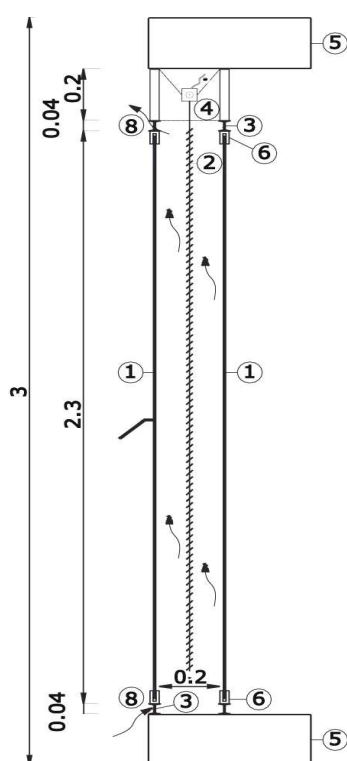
Example of a tested wall: double-skin façade: 1, 6 mm glass layer; 2, motorized solar protection ($W=0.025$ m); 3, metallic support; 4, solar protection action box; 5, structural concrete beam; 6, aluminum frame; 7, pane opening articulation; 8, ventilation openings.
